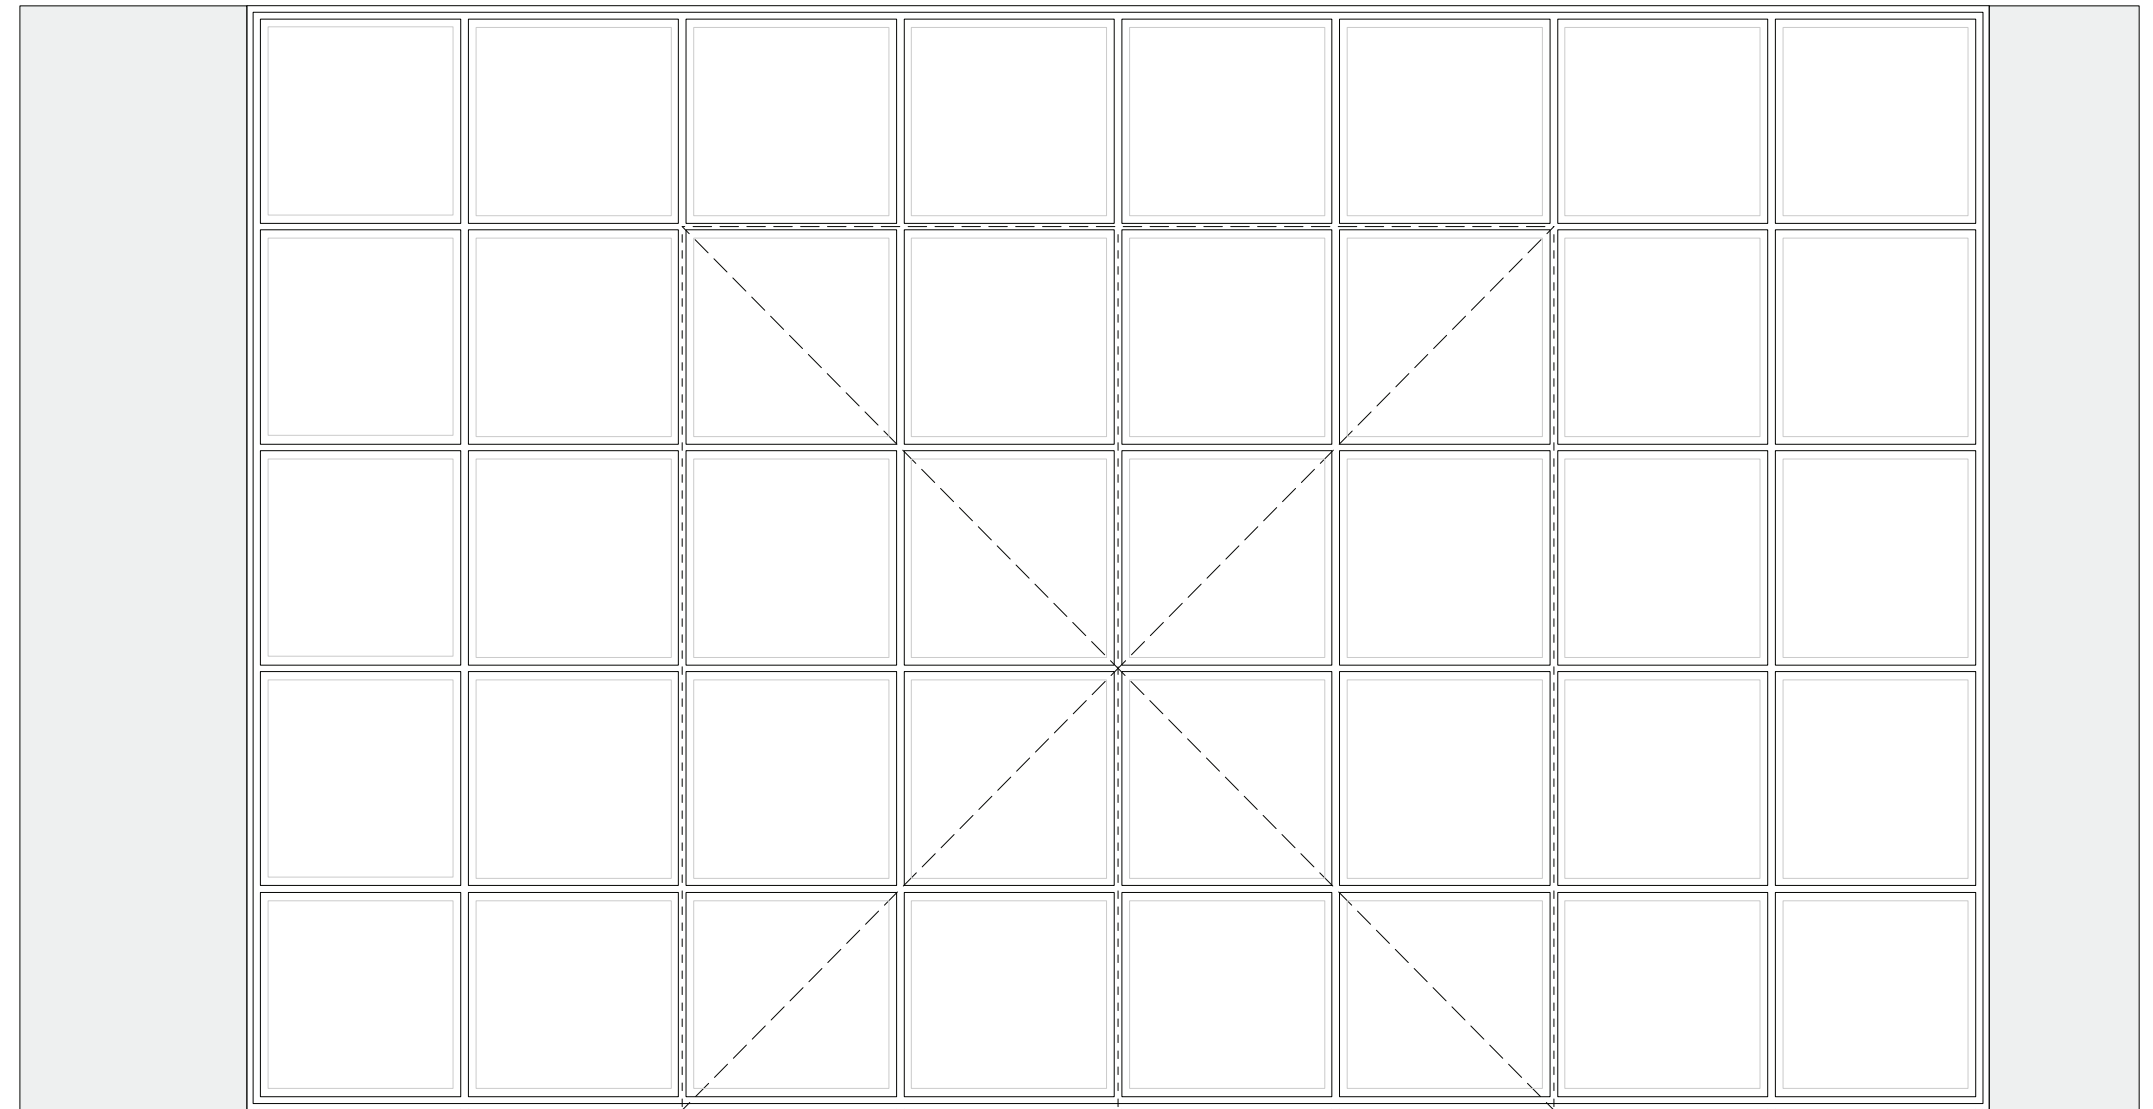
OF GLAZING JOIN WITH EXISTING BLOCKWORK WALL.
